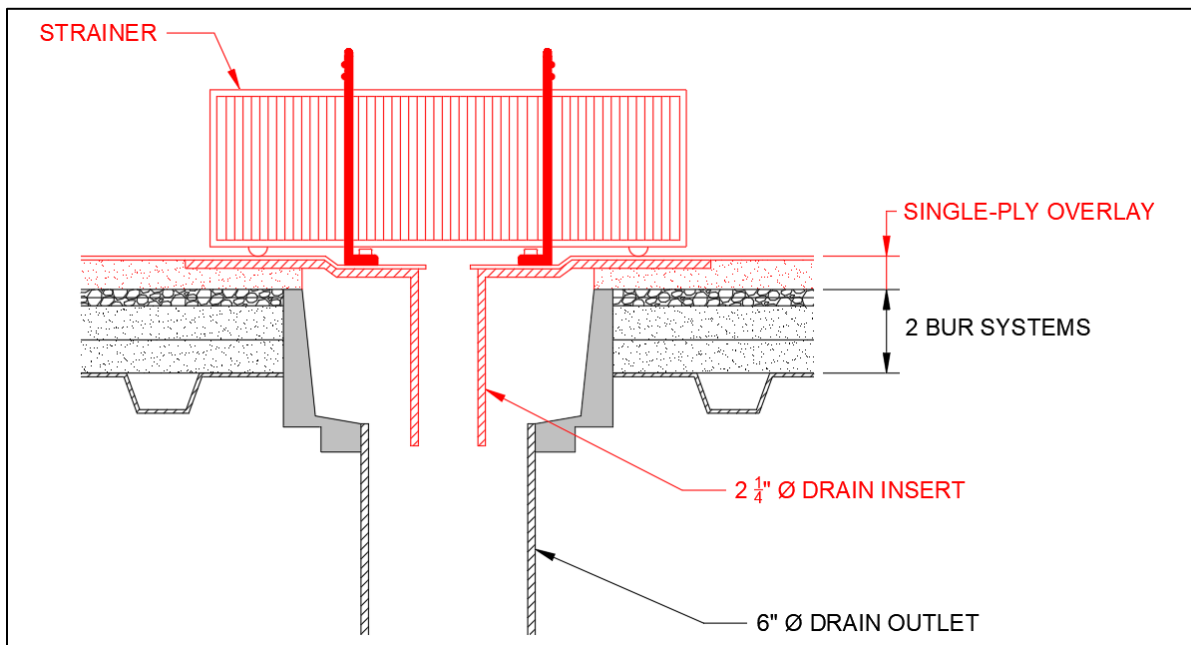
Modified galleria roof drain configuration (roof overlay components in red)
